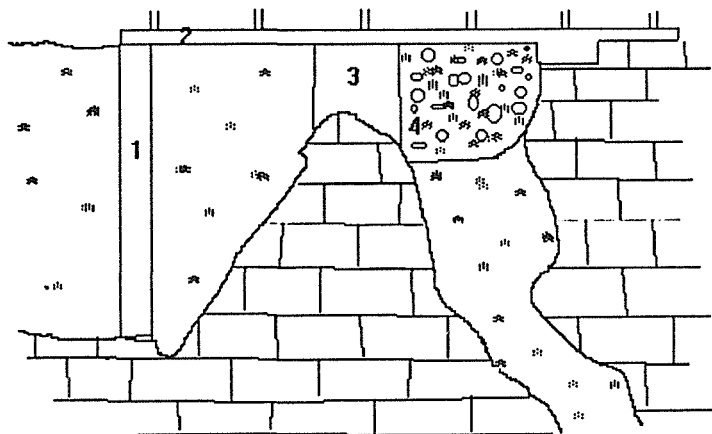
Procedure of karst foundation of Liu Panshui cinema, Guizhou province. 1.converted caisson; 2.concrete beam; 3.pier-type foundation; 4.backfill concrete.
